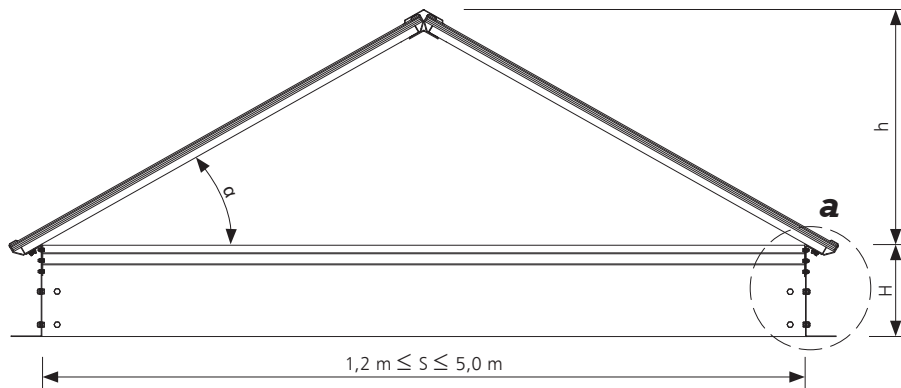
Cross section A-A of mcr PROLIGHT triangular shaped continuous rooflight
